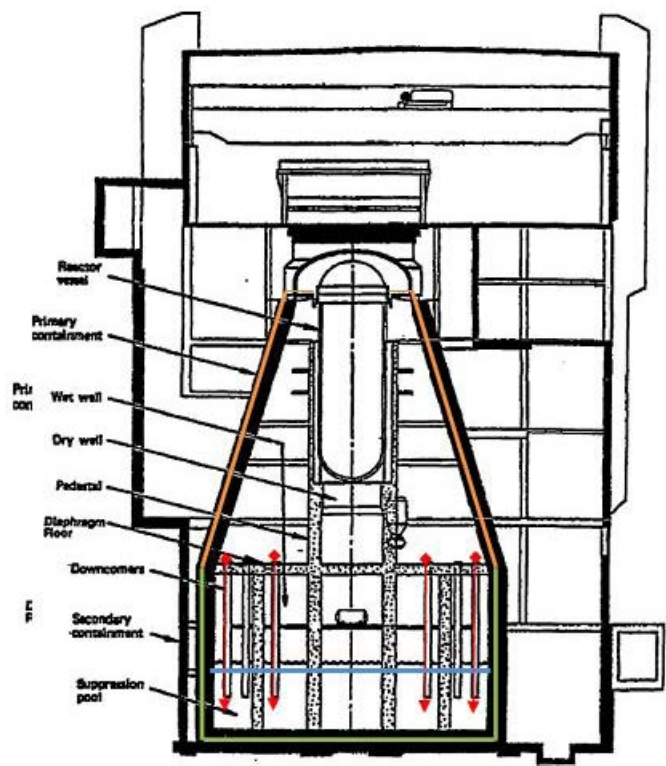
BWR Mark II Reinforced Concrete Containment (Limerick 1 & 2)
